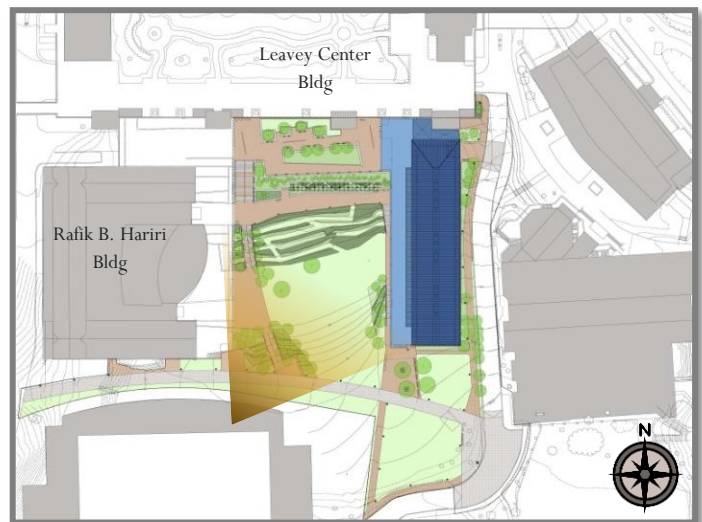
SITE PLAN - COURTESY OF PAYETTE
